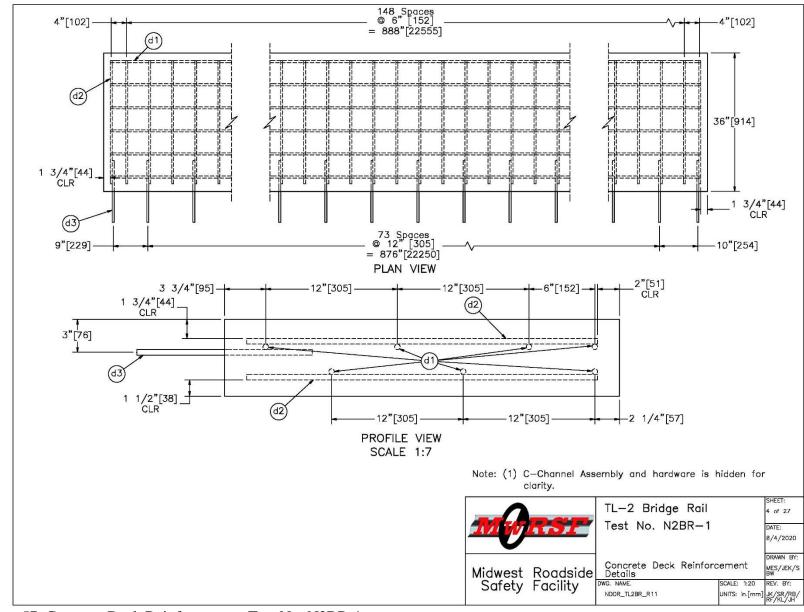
Concrete Deck Reinforcement, Test No. N2BR-1
